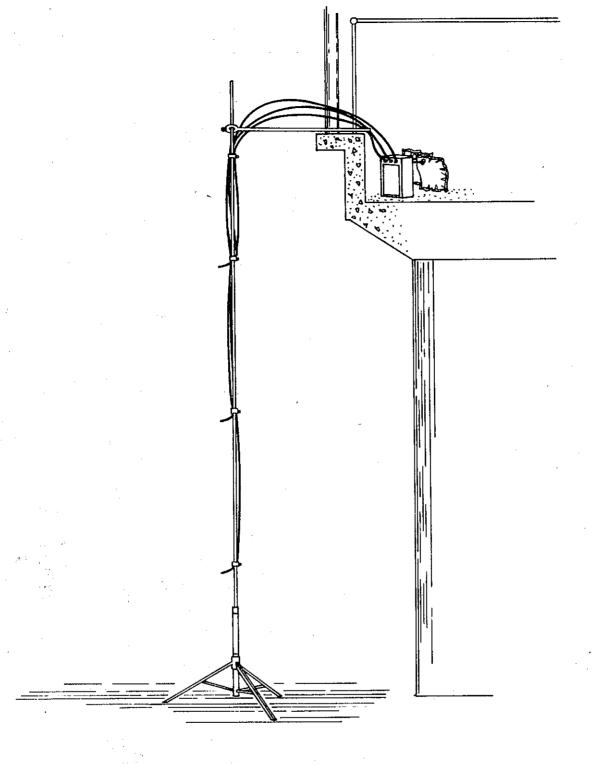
SETUP BELOW P.O.C. STRUCTURE FOR DEPRESSED FREEWAY SECTION
